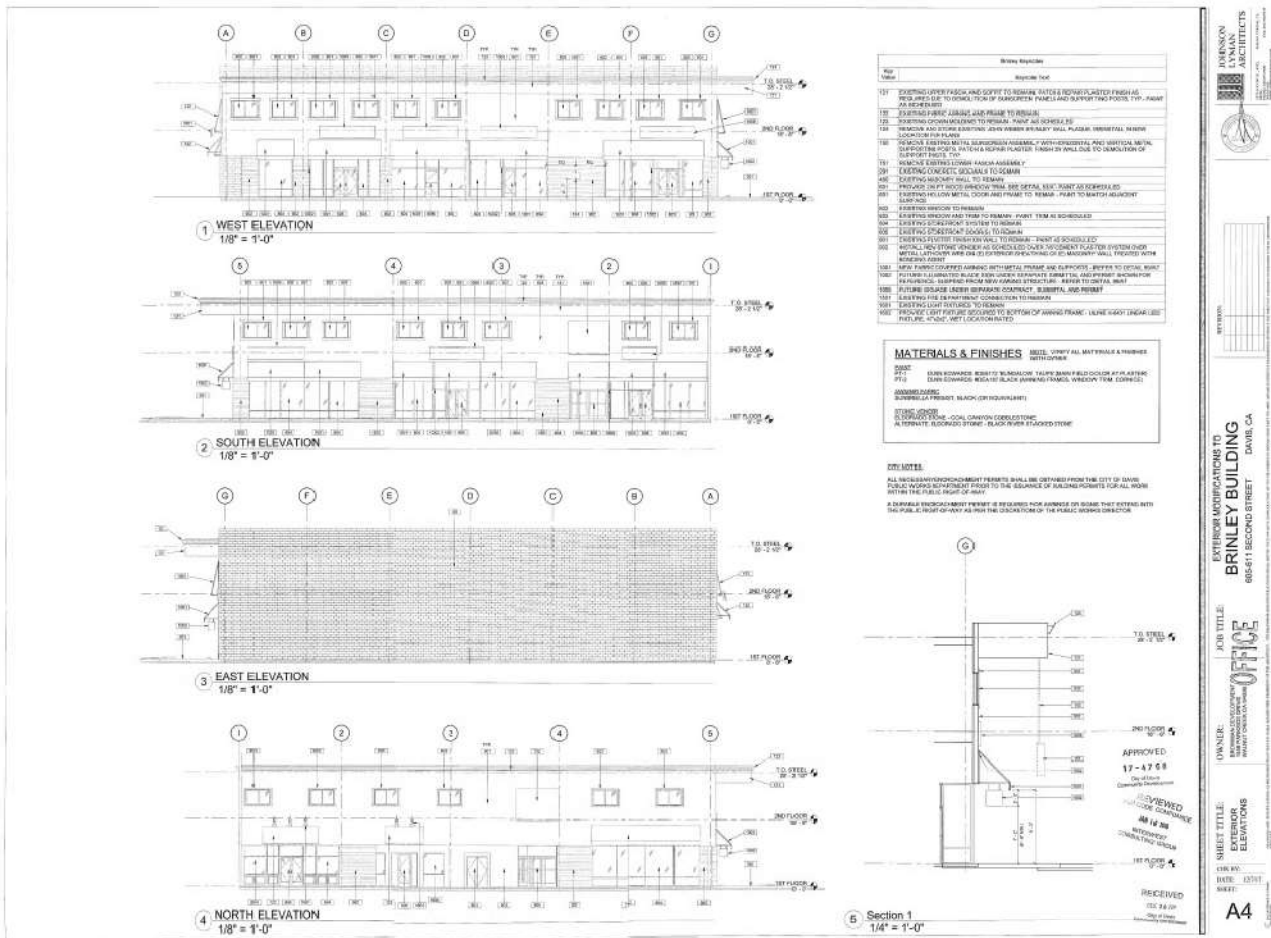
Façade Remodel Architectural Plans, December 7, 2017.
